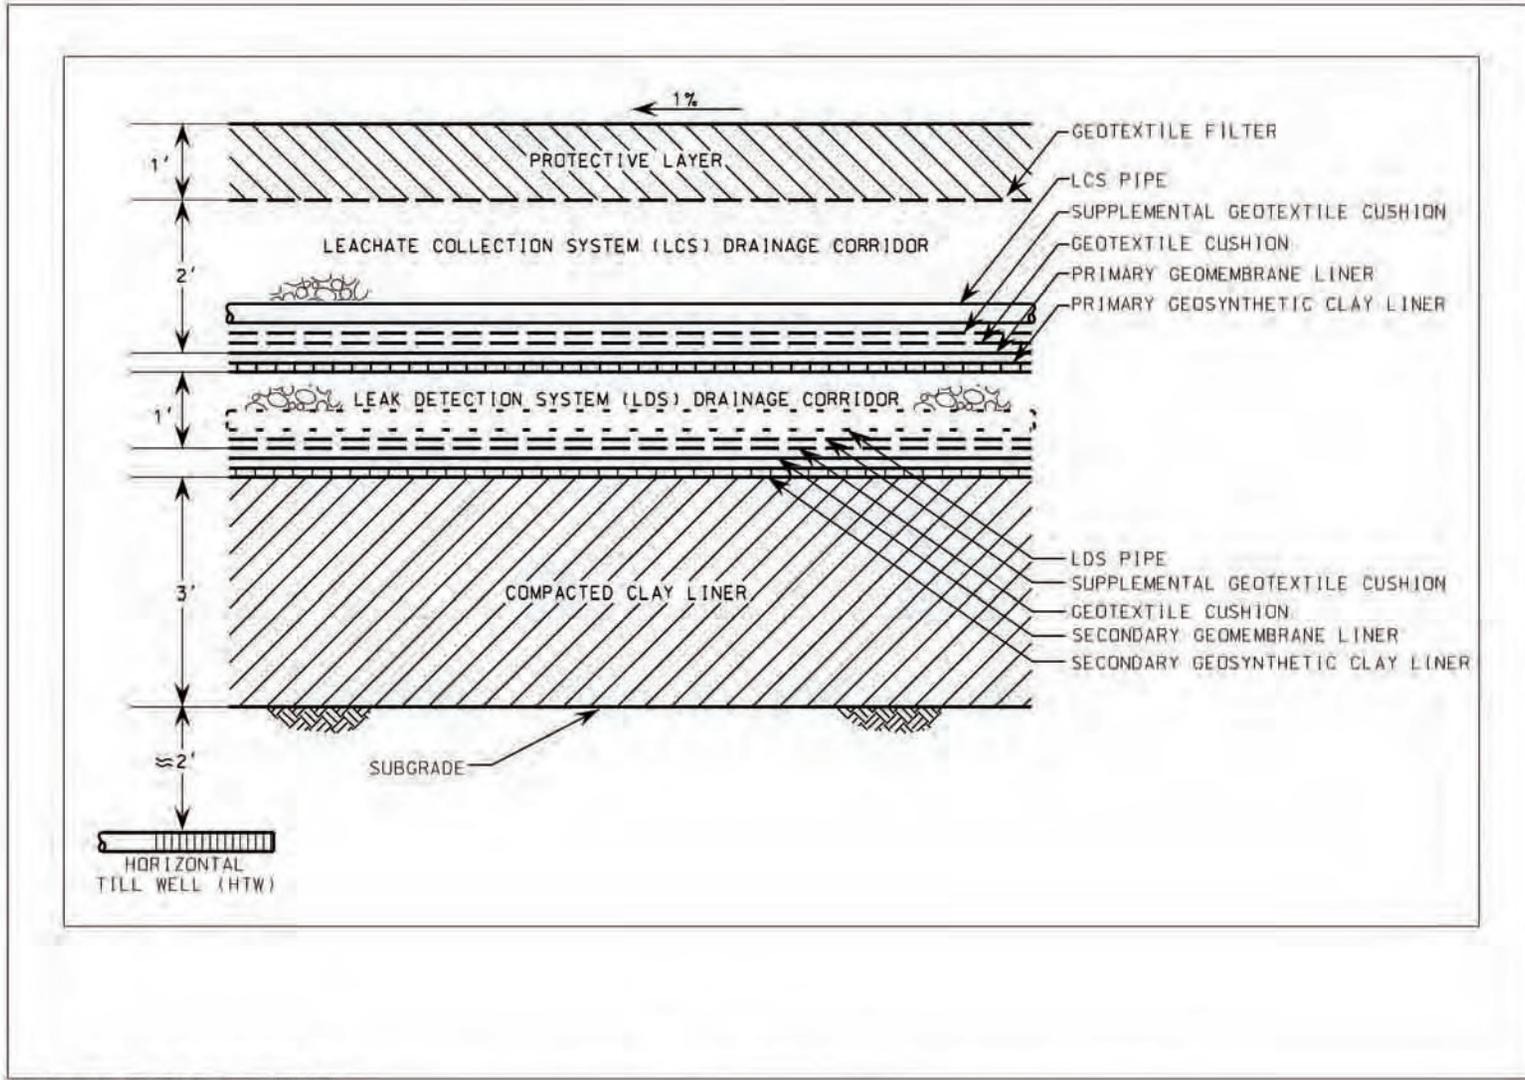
On-Site Disposal Facility Liner System with HTW at the Drainage Corridor
